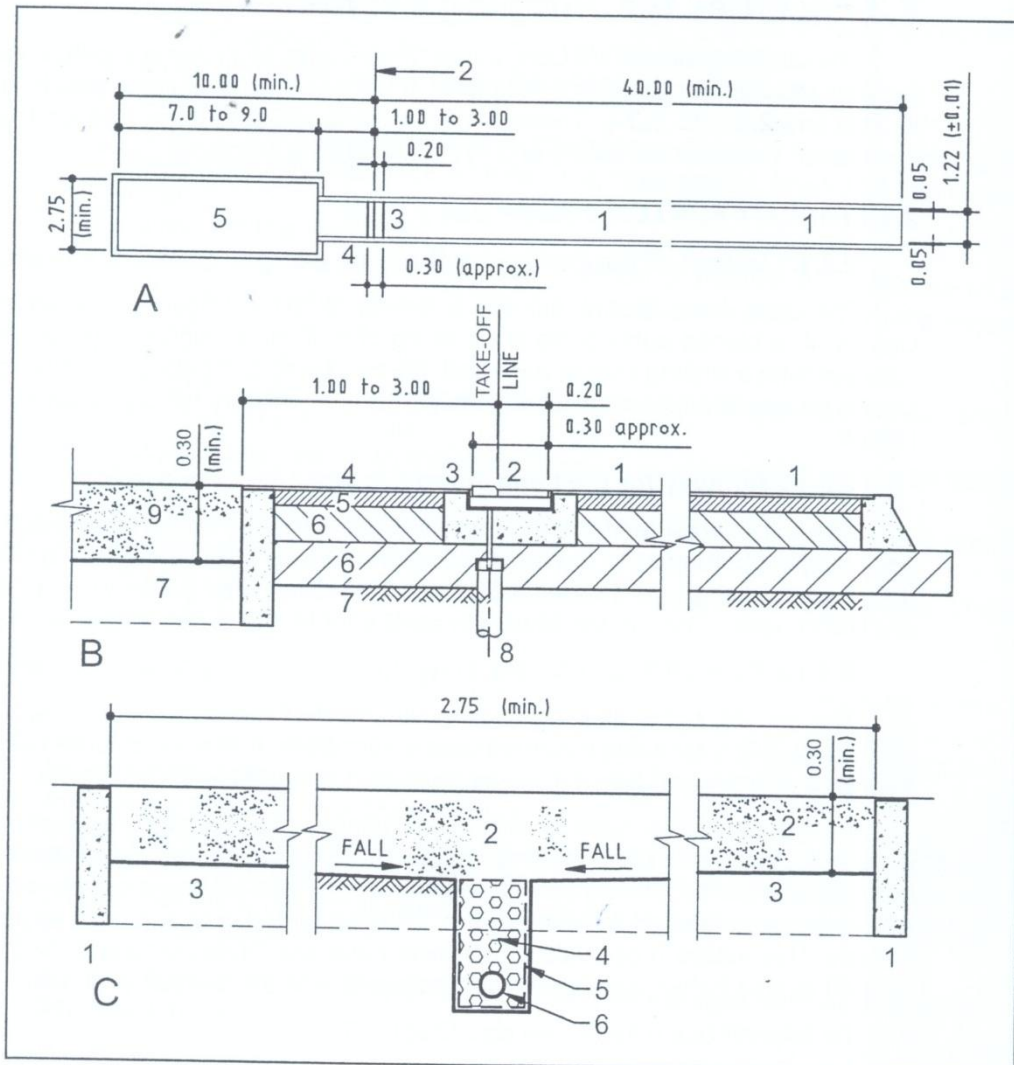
Facility for the Long Jump (Dimensions in m)
